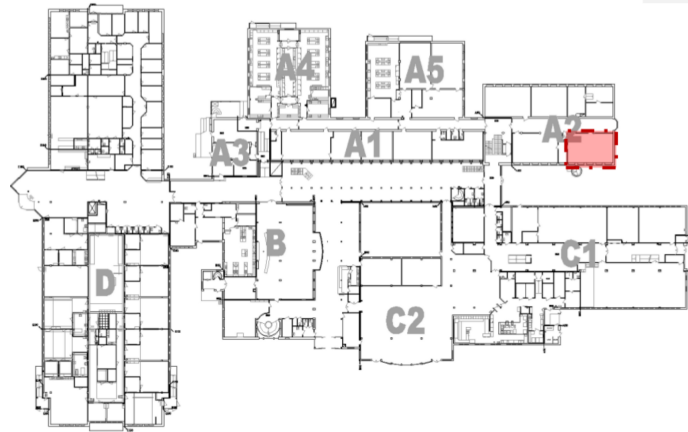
The school floor plan and room location in Skelleftea, Sweden.
